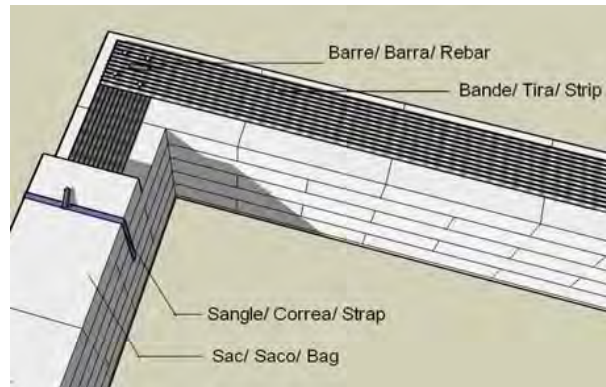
Corner Reinforcement Using Corrugated Metal Sheet (Hart, K. & Geiger O. (n.d.)).
